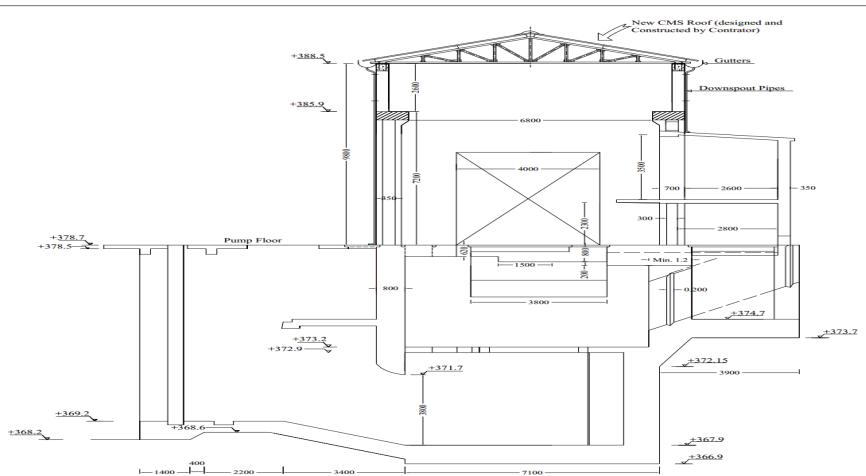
Typical Section Of The New Corrugated Metal Sheet (CMS) Roof
